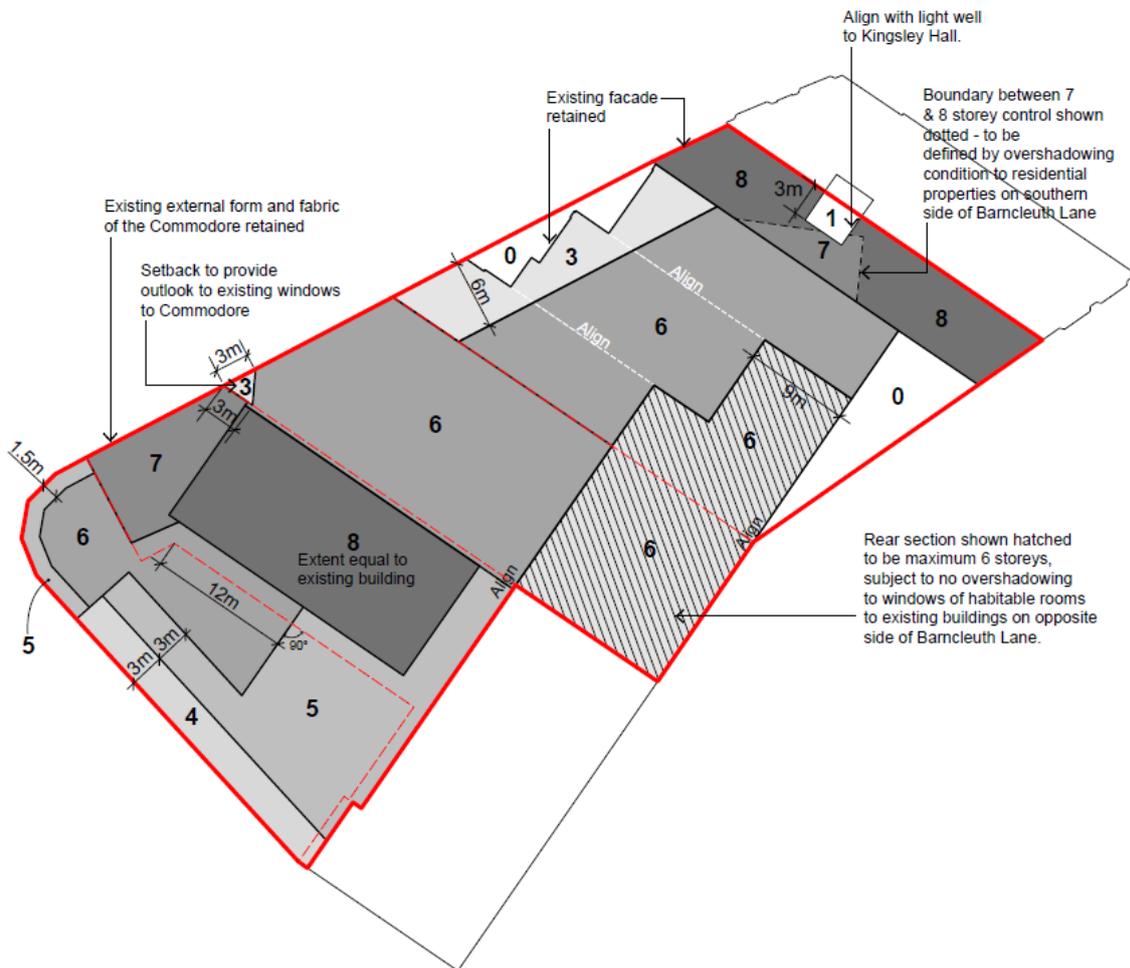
3m setback above 18-20 Darlinghurst Road for height of 1 storey above top of street wall, built to street alignment above
